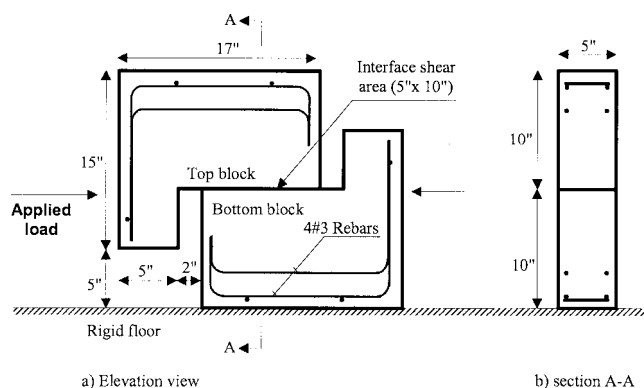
Details of push-off specimens (Note: 1 in. = 25.4 mm).
